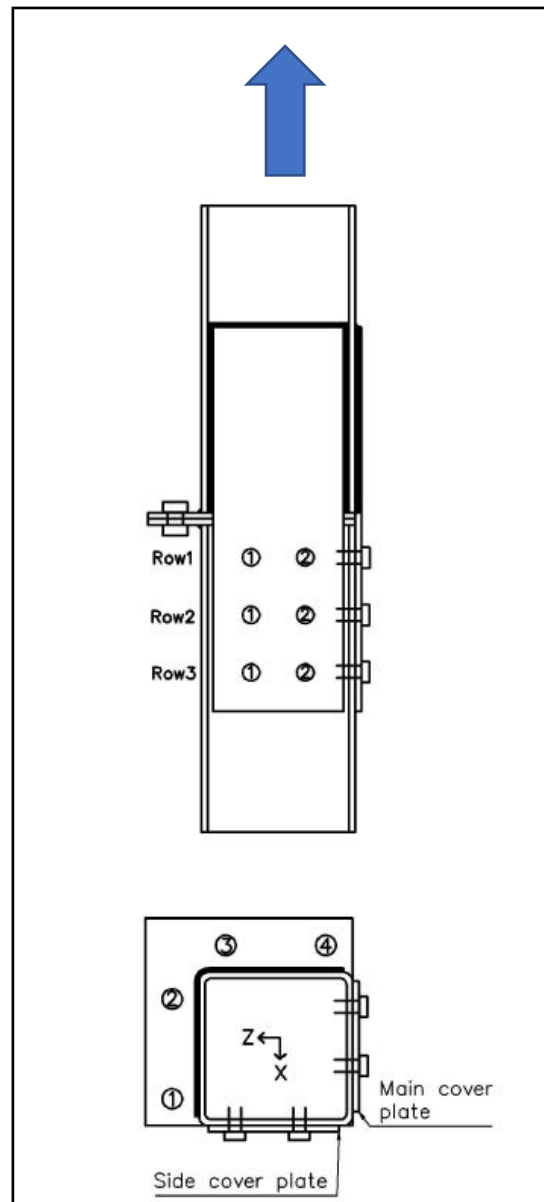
Plan and elevation of specimen CC-1 (case 3)
